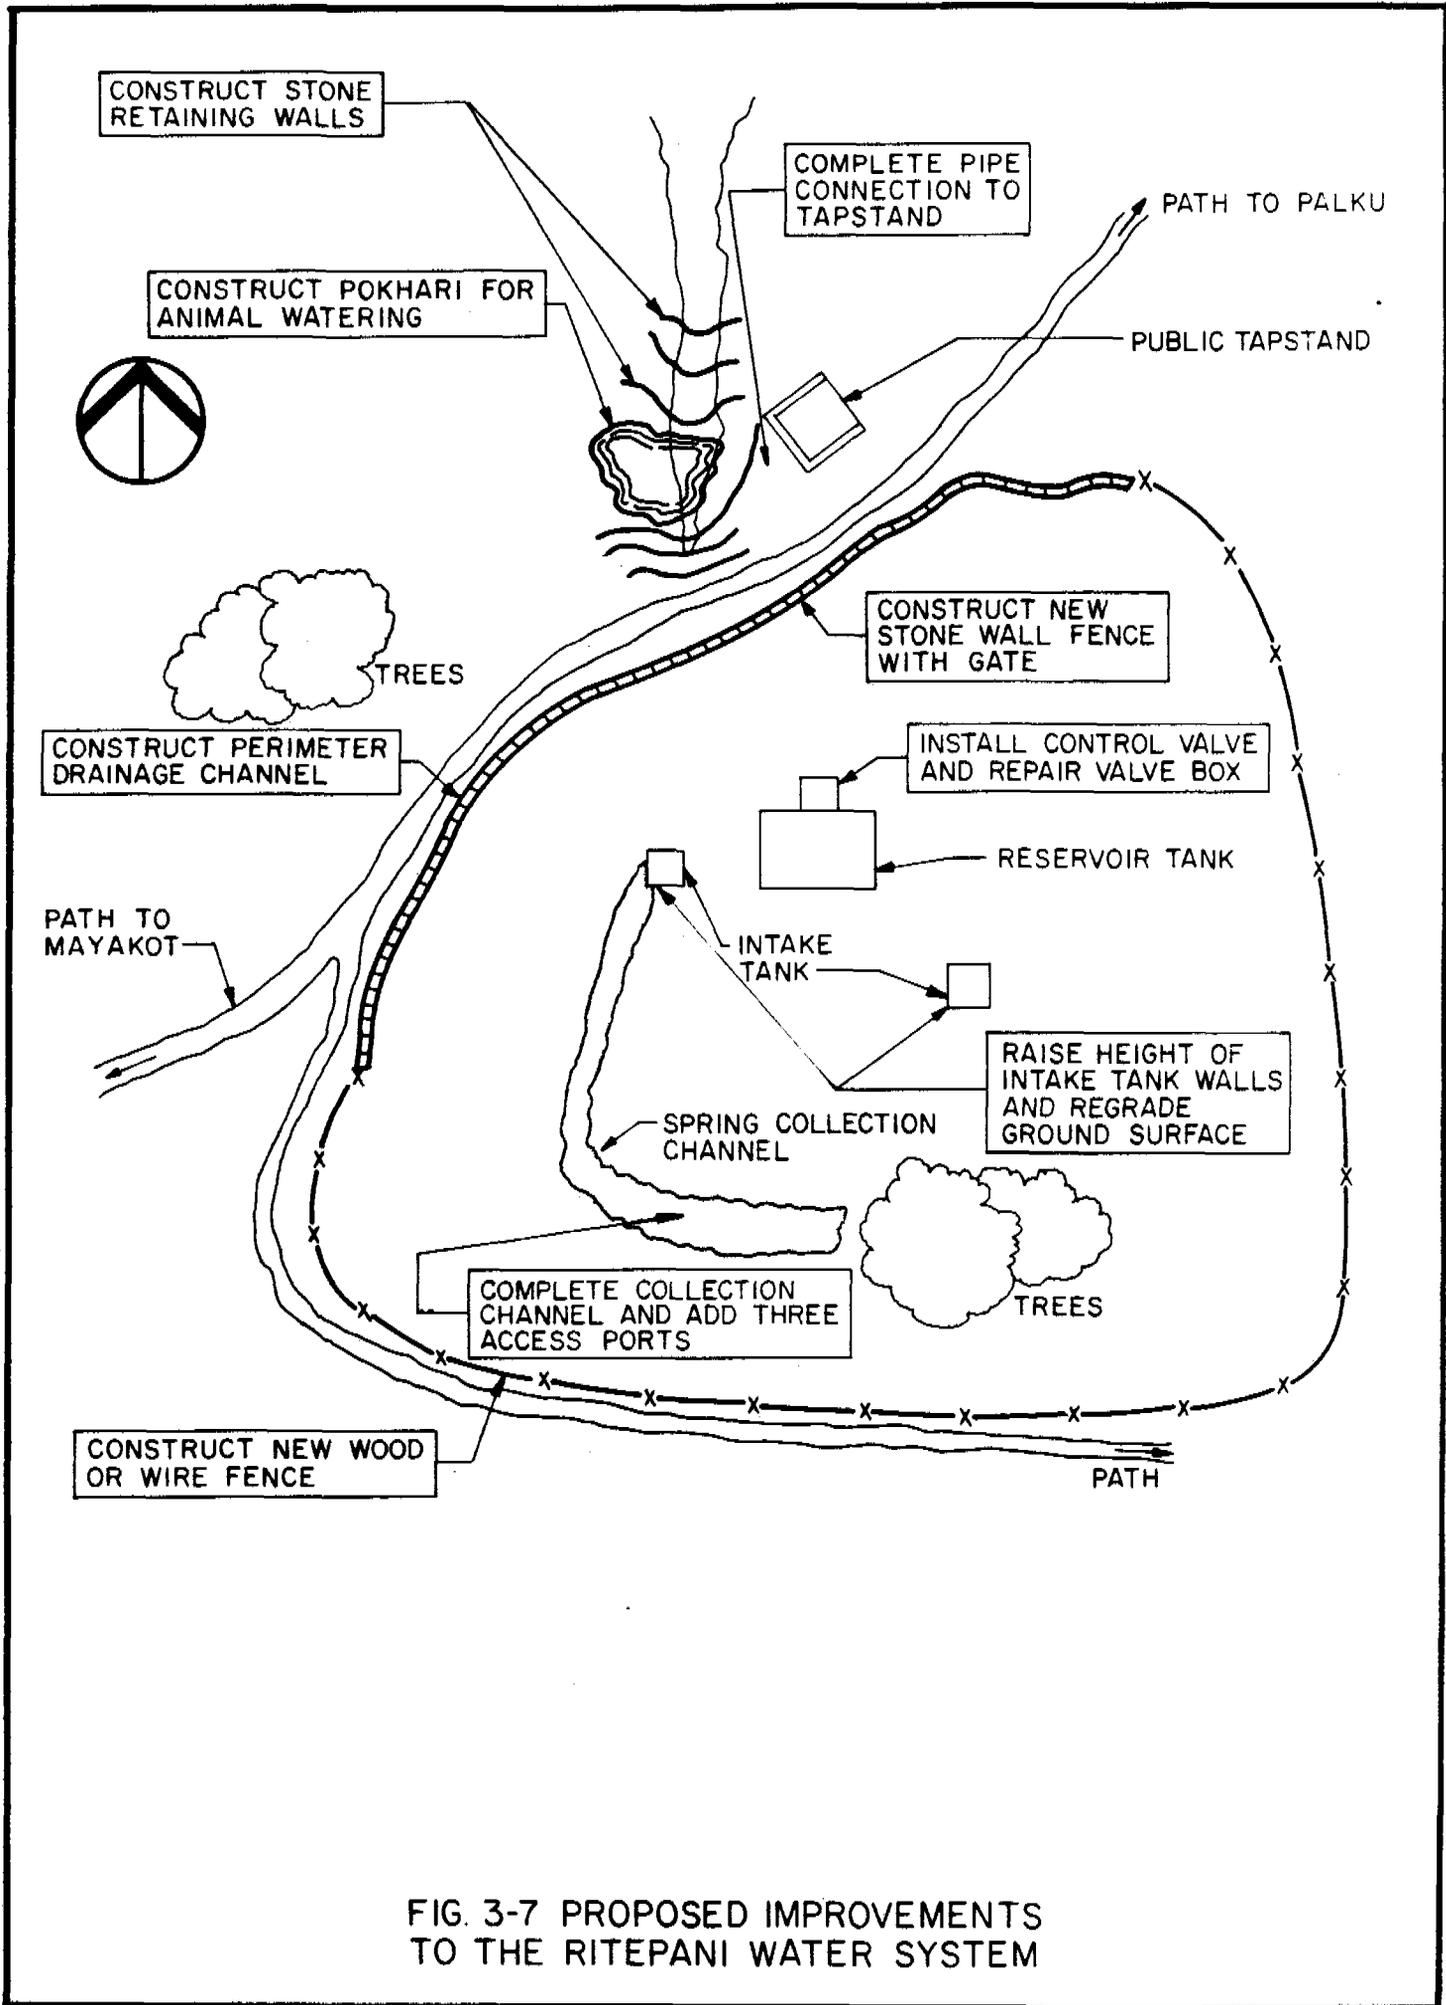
PROPOSED IMPROVEMENTS TO THE RITEPANI WATER SYSTEM
